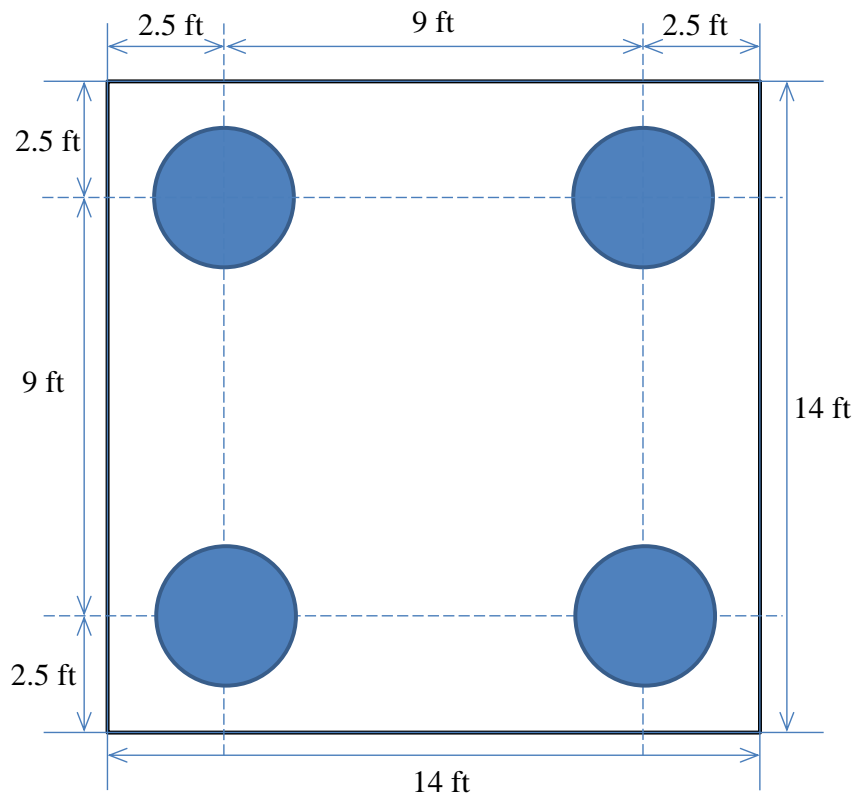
Final layout of four 51-ft by 3-ft diameter drilled shafts per cap
